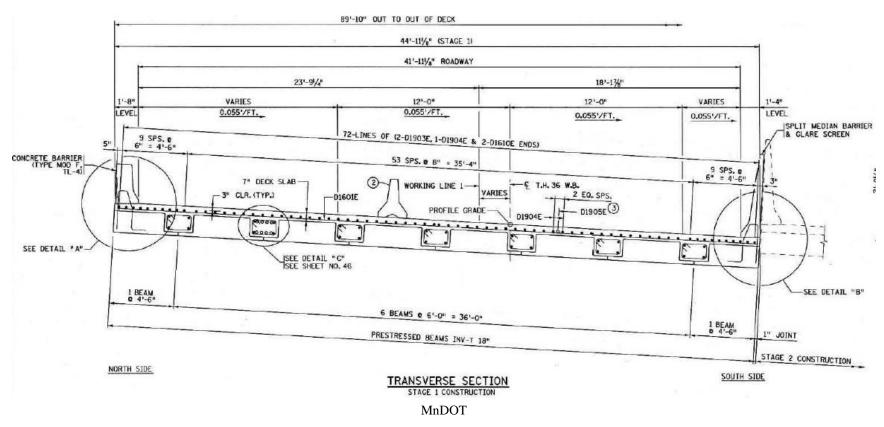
Superstructure cross-section with deck reinforcement and interconnecting diaphragm reinforcement
